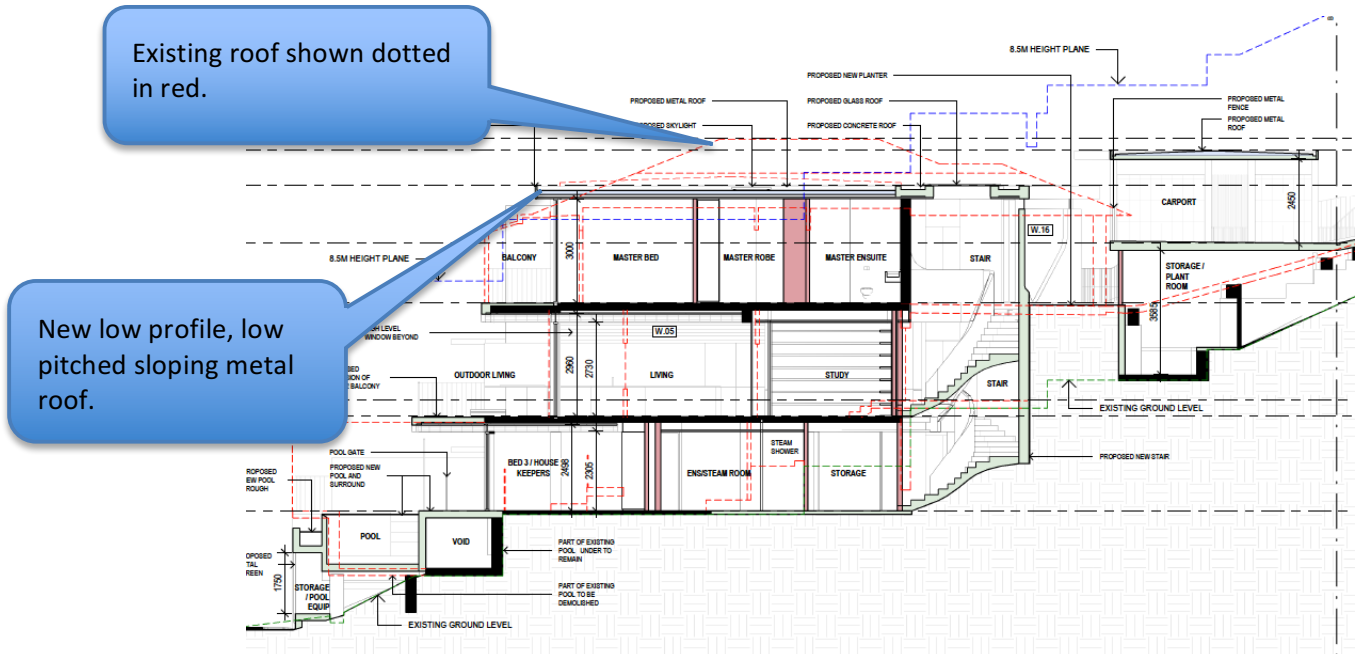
Extract from Drawing DA321 Section AA, showing the height of the existing roof and the new roof above the previously excavated lower ground floor level.
